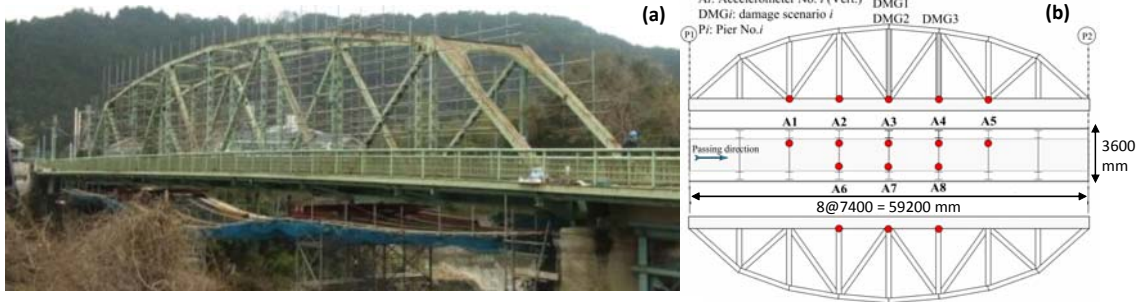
Steel truss bridge (a); sensor & damage locations (b)
